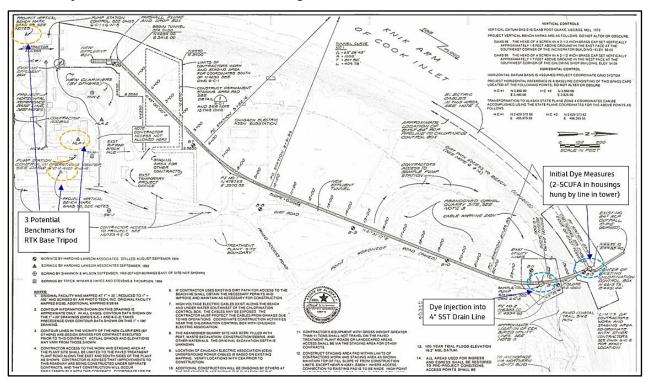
Plan View Drawing of AWPCF Outfall Showing Locations of the Potential Survey Benchmarks at the AWPCF, the Planned Dye Injection Site at the Outfall Tunnel Sample Pump Station, and the Initial Dye Measurements Site at the Outfall Chlorination Tower
